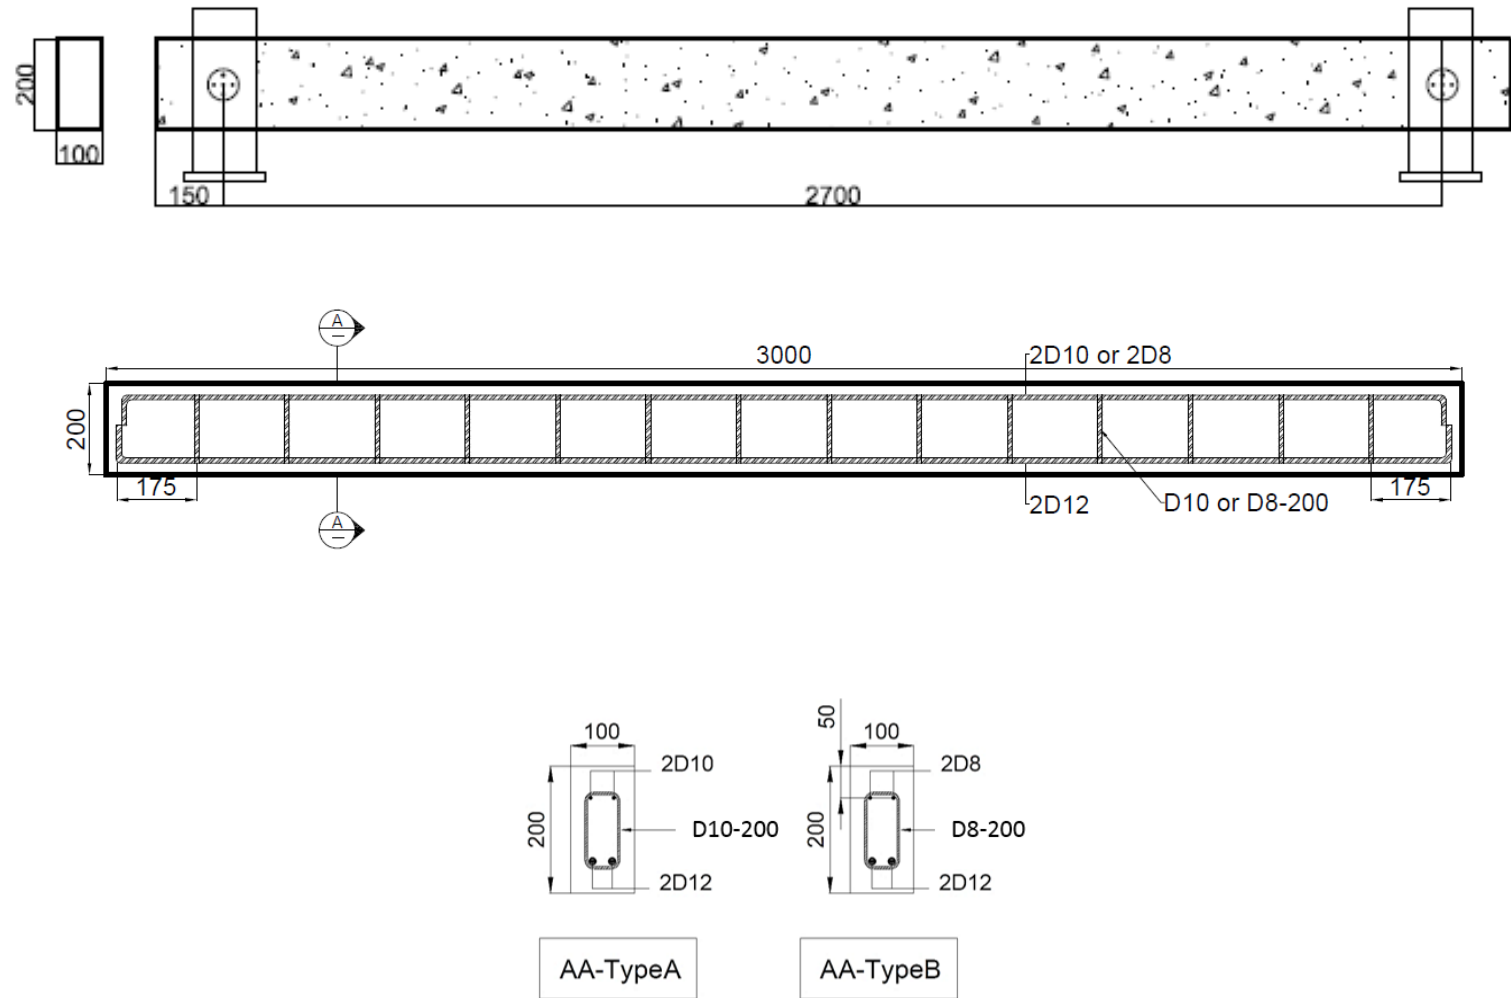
Design of the RC beam specimen (units are in mm)-cover 50 mm
